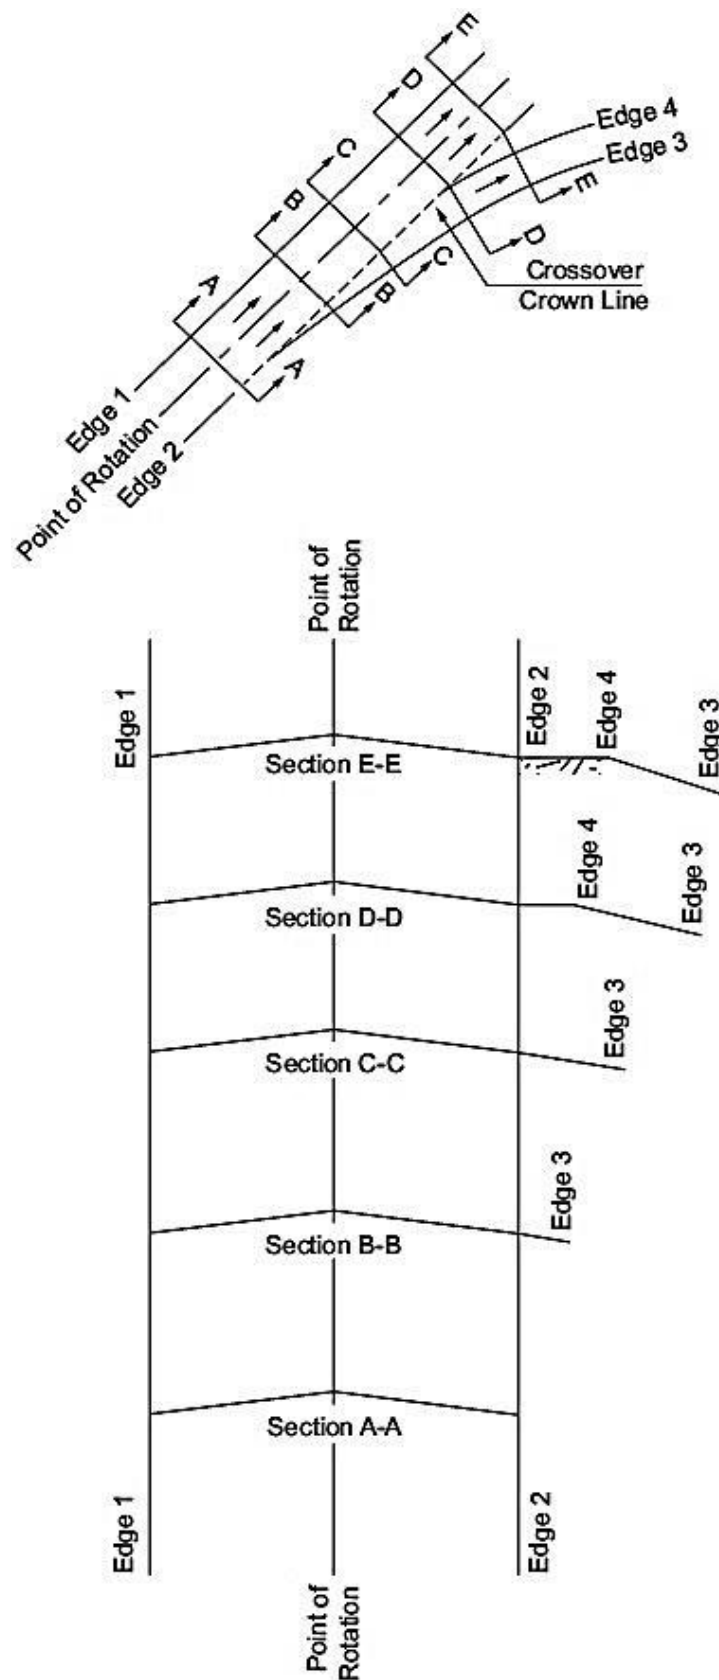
/1: Development of Superelevation at Turning Roadway Terminals [4, p. 648]
